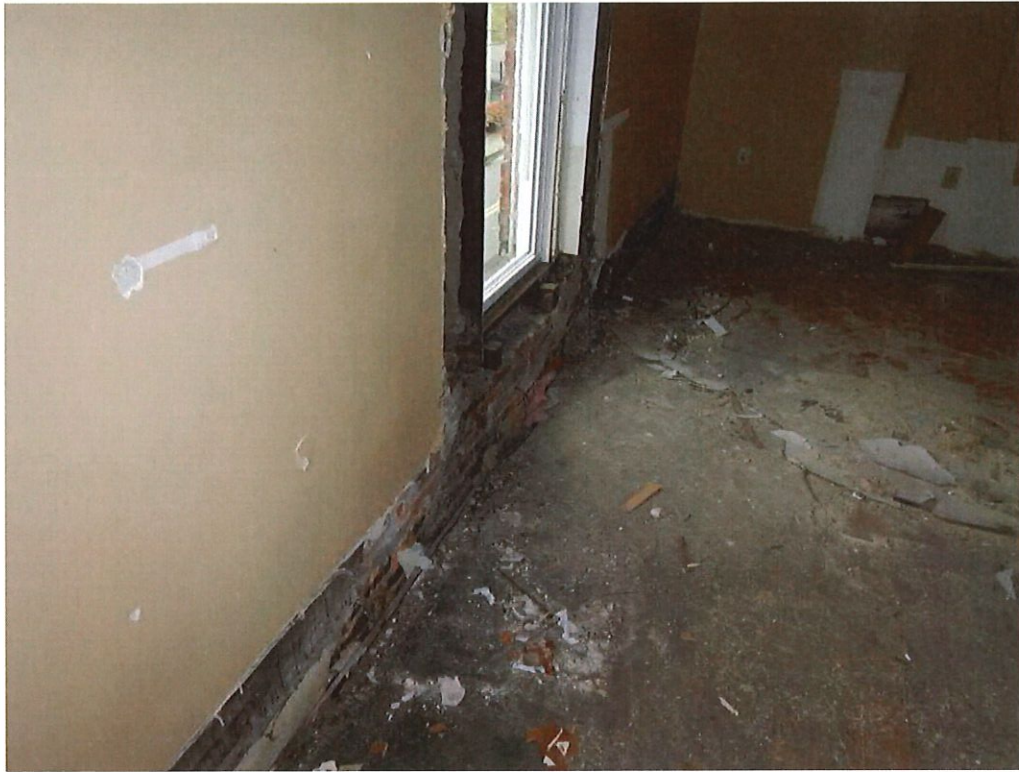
Gap between the floor covering and the masonry wall on the upper floor.
